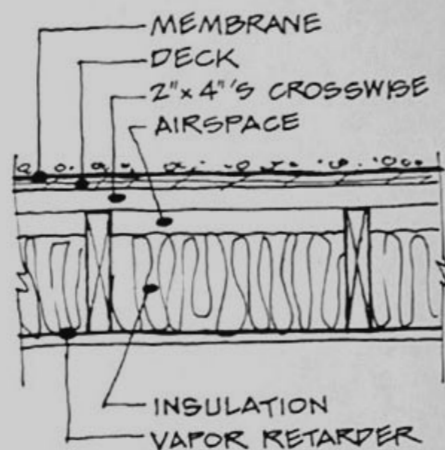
Flat woodframe roofs need a good air/vapor barrier and good ventilation. A ventilation plenum can be formed by laying 2x4's across the joists.
